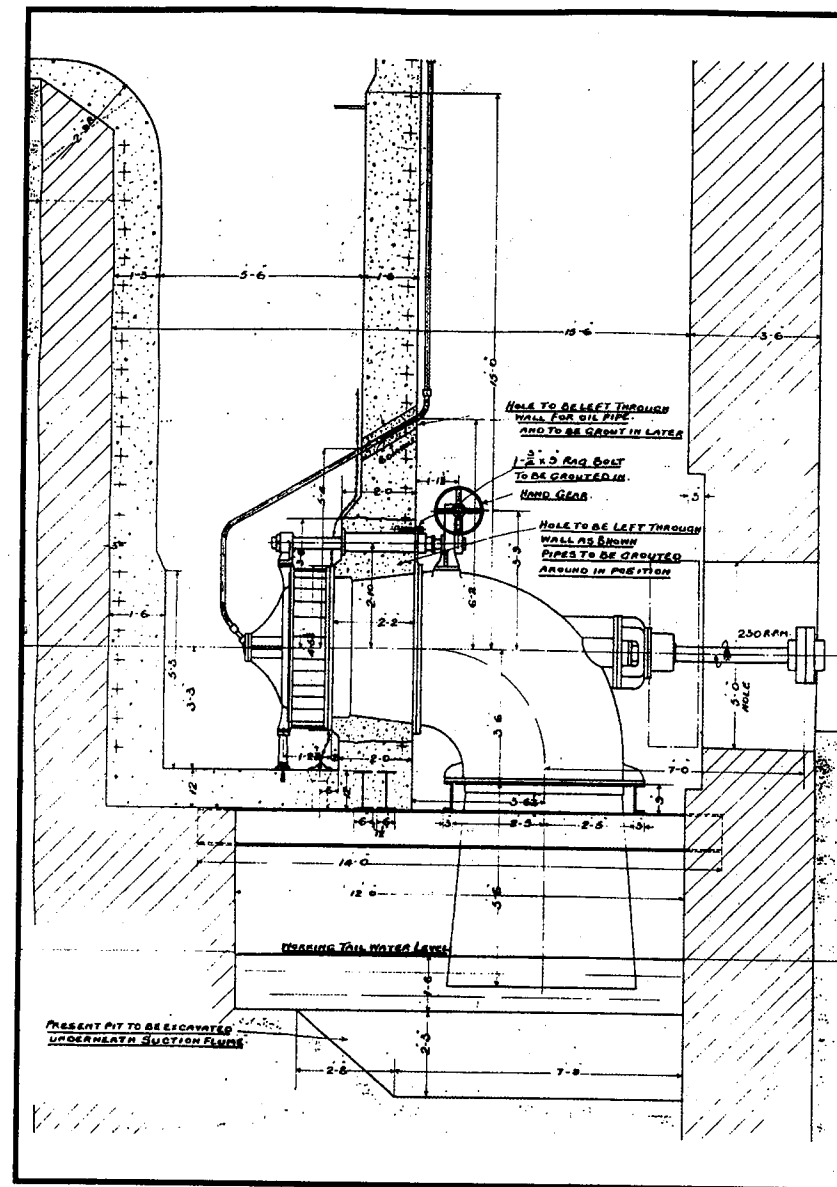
Gilbert, Gilkes & Co. Ltd. drawing of the 268 H.P. Series 'R' turbine installed in 1933 at the Higher Mill, Bosley. The turbine is fitted in an open chamber (on the left of the drawing) without a spiral case. (The strainers, etc., have not been shown at the top of the chamber.)
